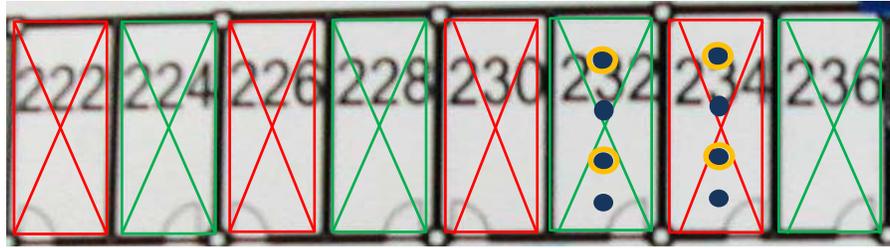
Monterey Study Area - Ceiling and Work Station Loggers
